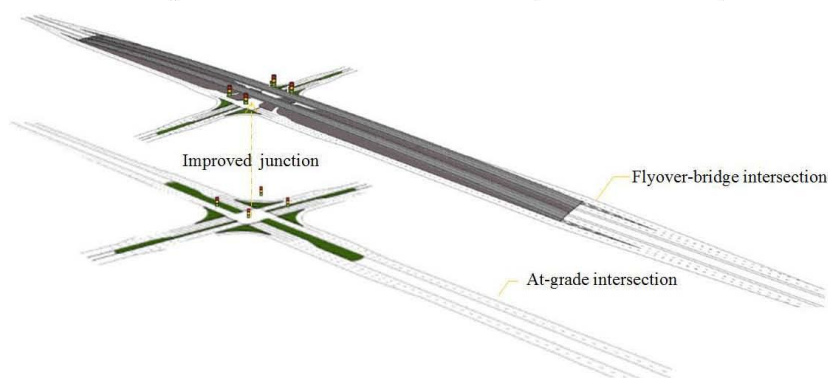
The layout of an at-grade intersection converted to a flyover-bridge intersection.
